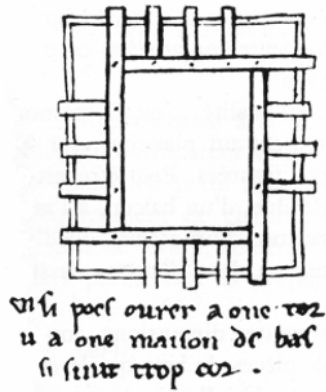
How to build a floor with beams that are too short. From Villard de Honnecourt's portfolio (1225-1250)
